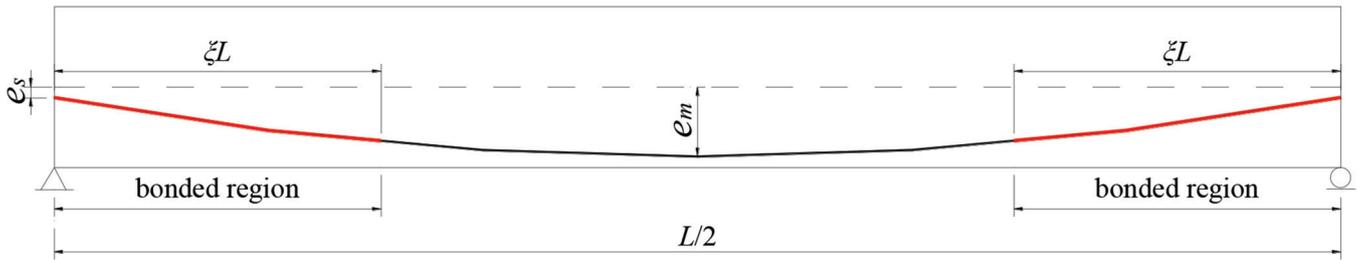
Schematic diagram of partially bonded prestressed concrete beam.
